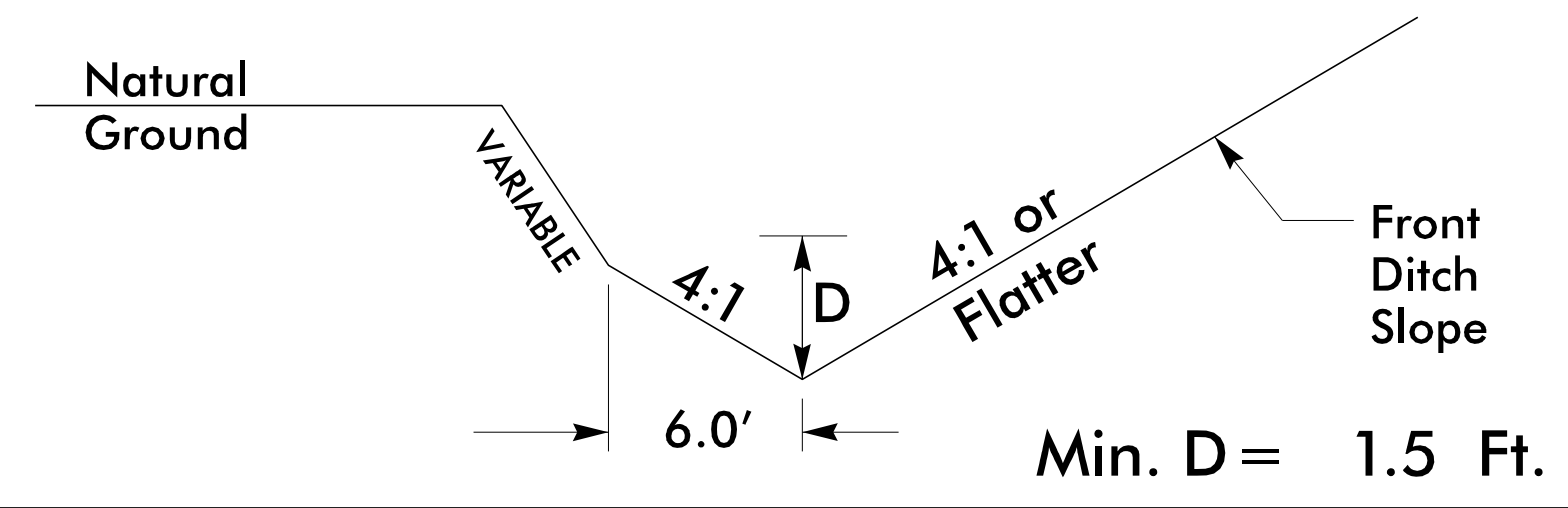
SPECIAL LATERAL BASE DITCH (Not to Scale)
